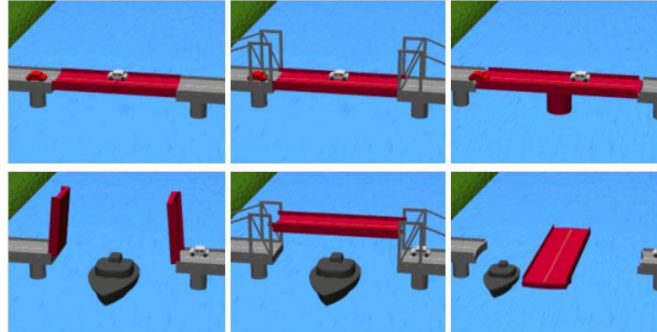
Moveable Bridge: (Left) Folding Bridge; (Middle) Lift Bridge; (Right) Swing Bridge (Moveable Bridge, 2016)
